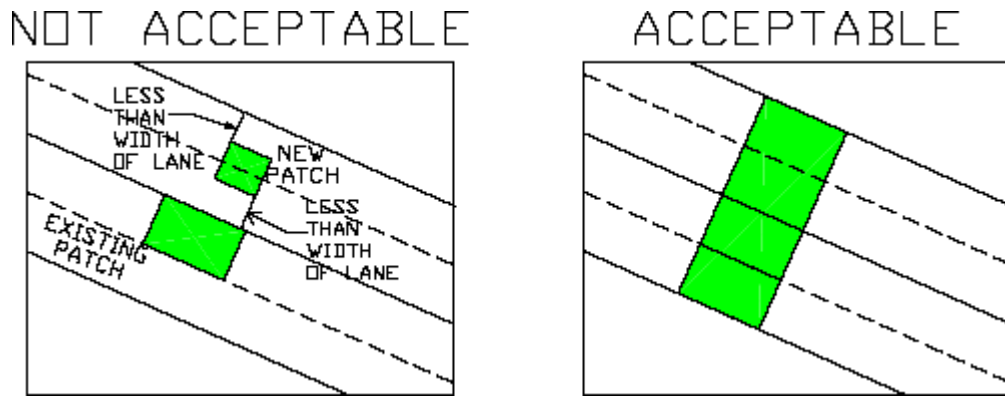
Example 3: Do not leave strips of pavement less than one-half lane in width.
